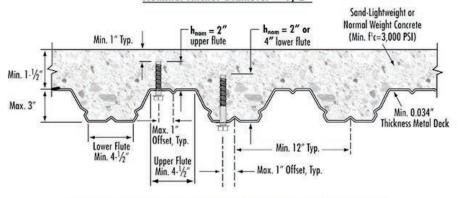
TAPCON+ SCREW ANCHOR LOCATED IN THE SOFFIT OF CONCRETE OVER STEEL DECK FLOOR AND ROOF ASSEMBLIES (1 inch = 25.4 mm)
